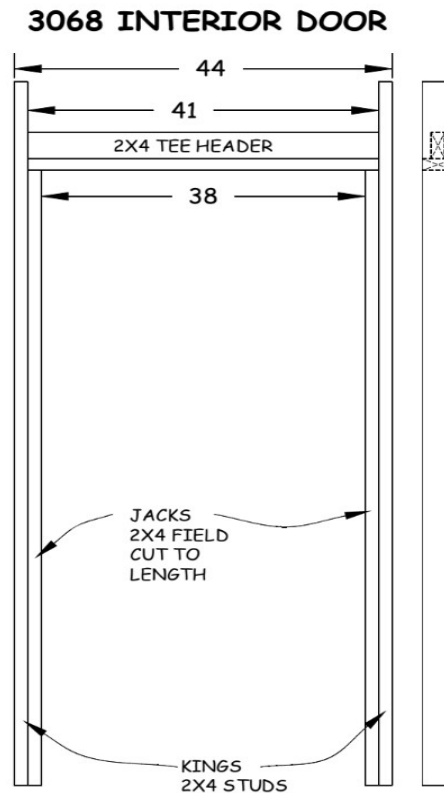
Example of Interior Wall Component Assembly Drawing.
